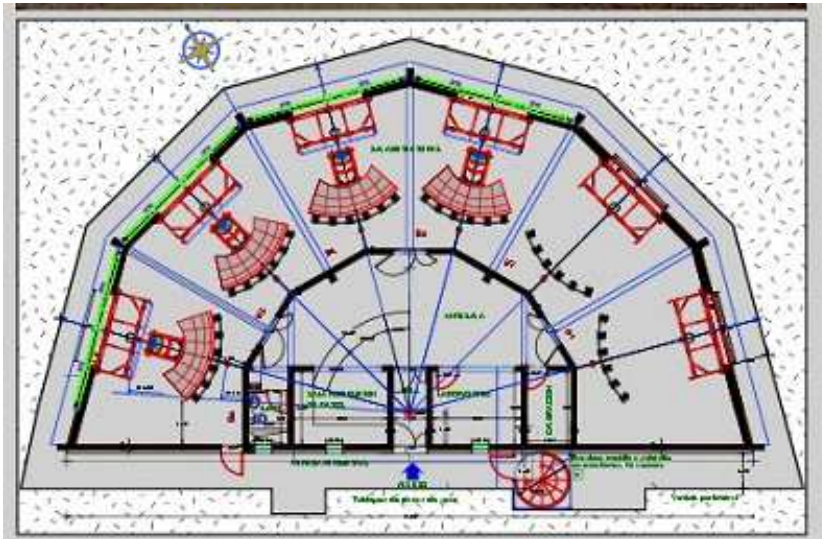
Planimetry of Los Leones (Eye1) building; 4 out of 6 telescopes are shown.
